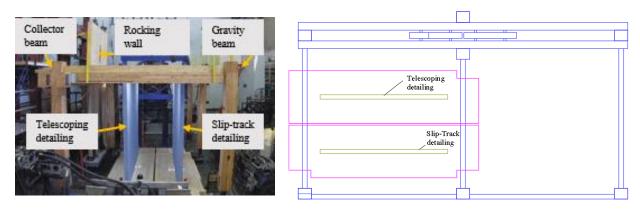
(a) Drywall partition walls installed between CLT diaphragms; (b) position of drywall partition walls in the structure
